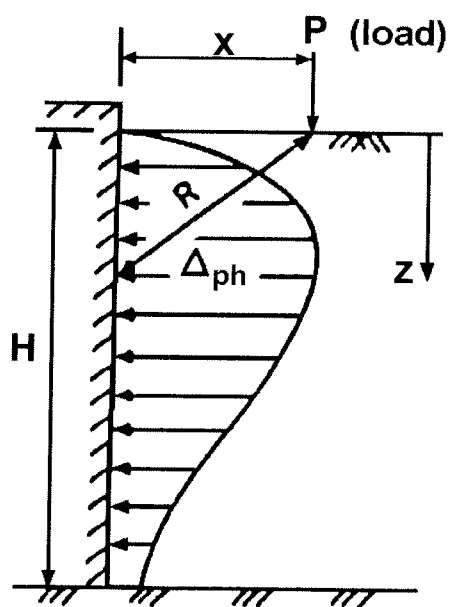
Horizontal Pressure on a Wall Caused by a Point Load.
